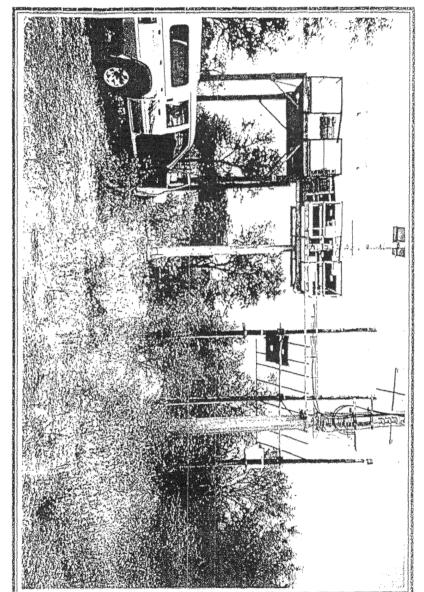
Site 3 (24 Riviere). Existing Telkom mast.
